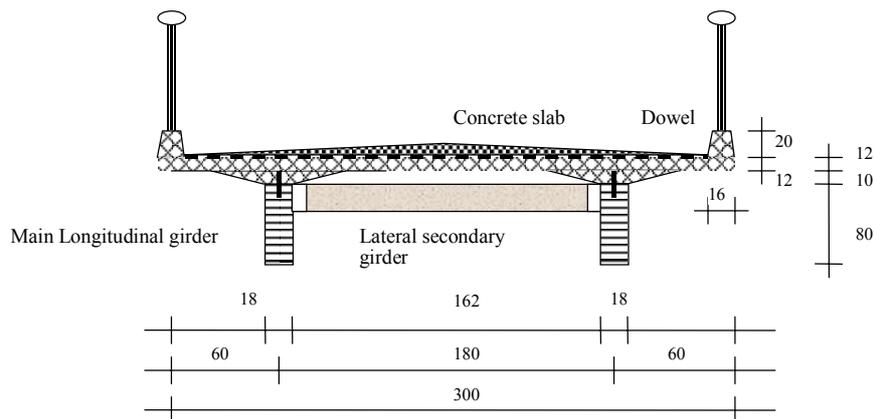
Characteristic lateral cross-section of a footbridge structure
